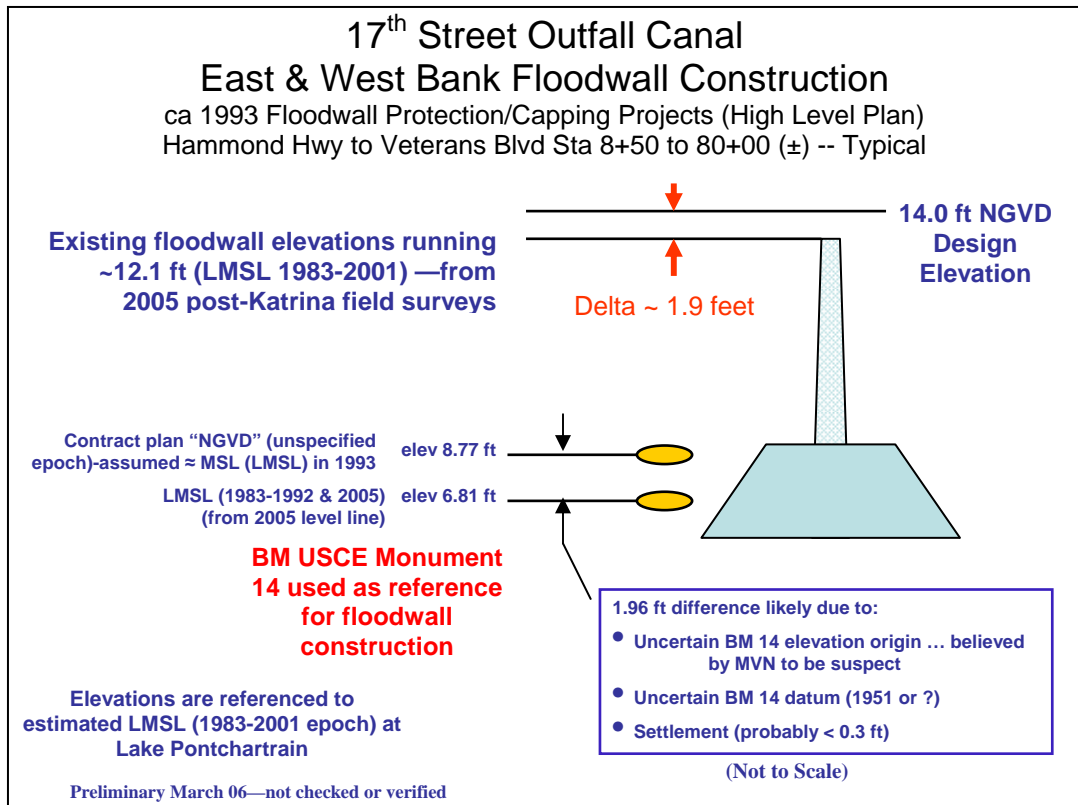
Design vs. Current Floodwall Elevation—East Bank 17th St Outfall Canal
